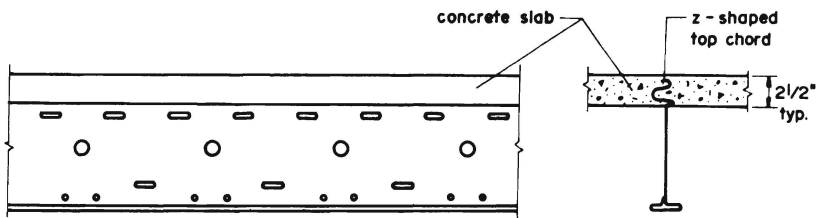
New cold-formed steel joist for composite floor (1 in. = 25.4mm)
